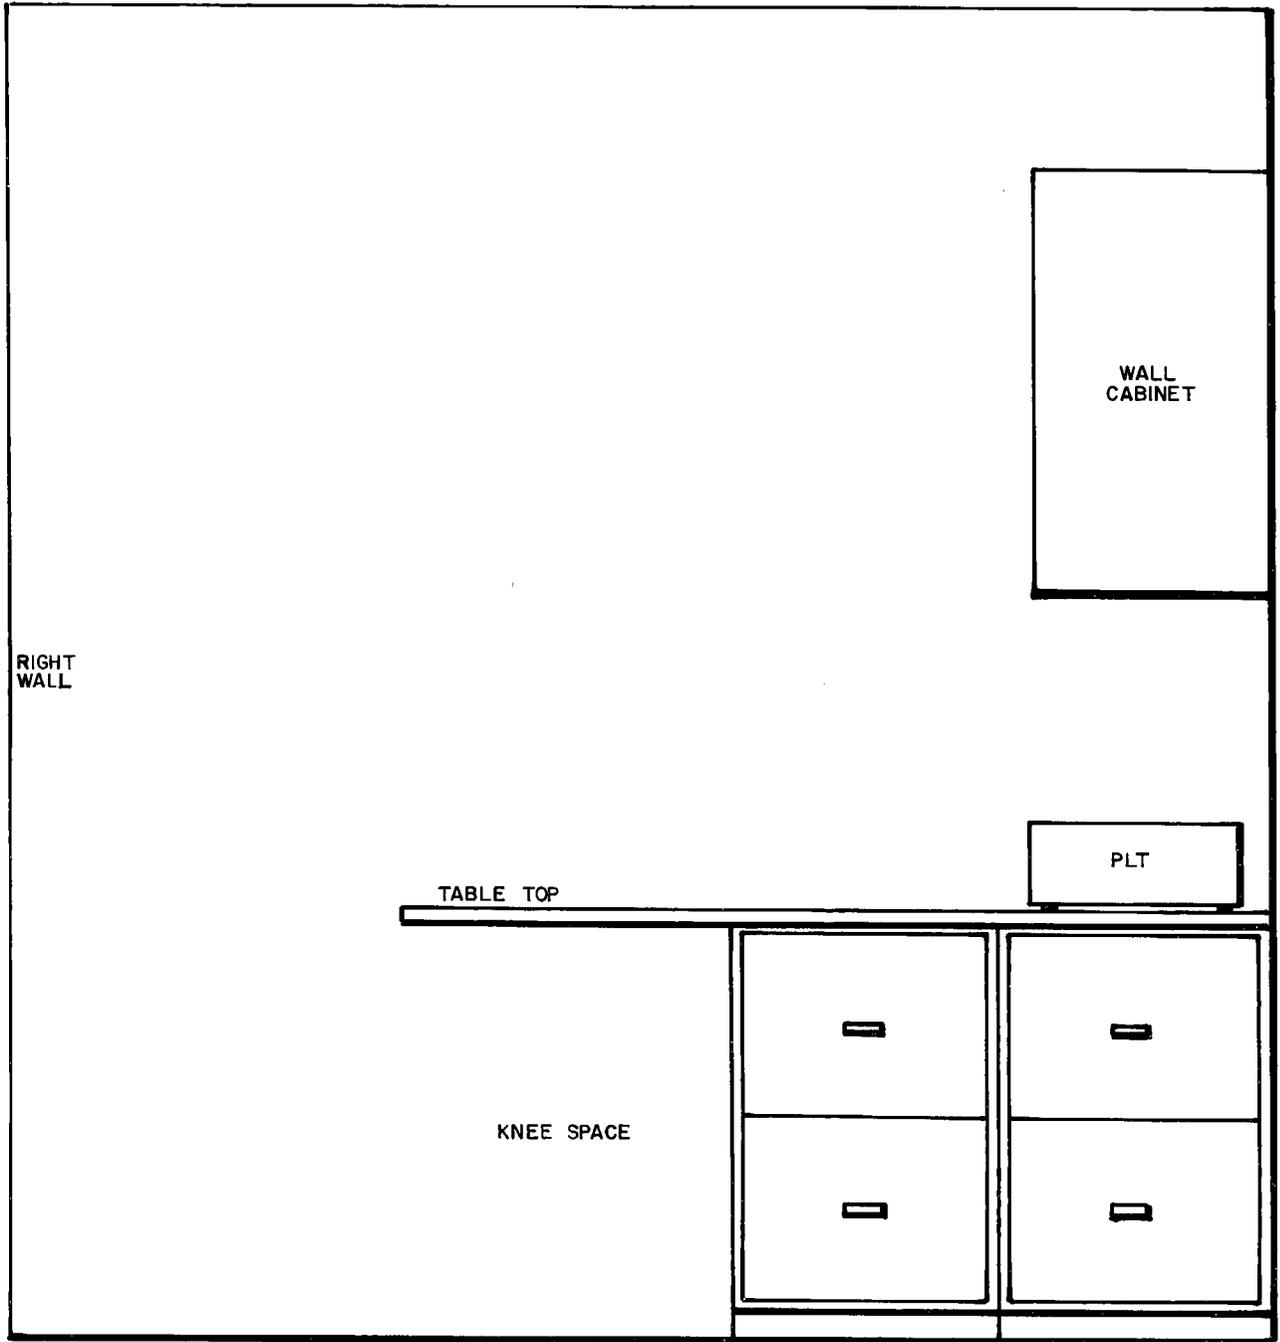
Front of Aerosol Island Bench (Section F-F of floor plan)
